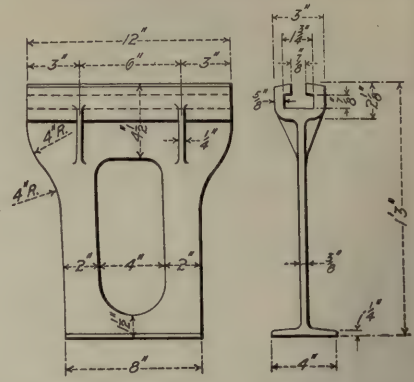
R. S. A. Standard Pipe Carrier Concrete Foundation.
